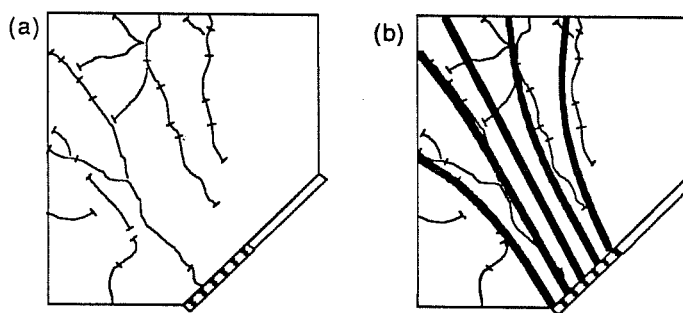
Crack Pattern and Stress Field for Specimen LFAC with 30°-10.6 in. Compression Strut
